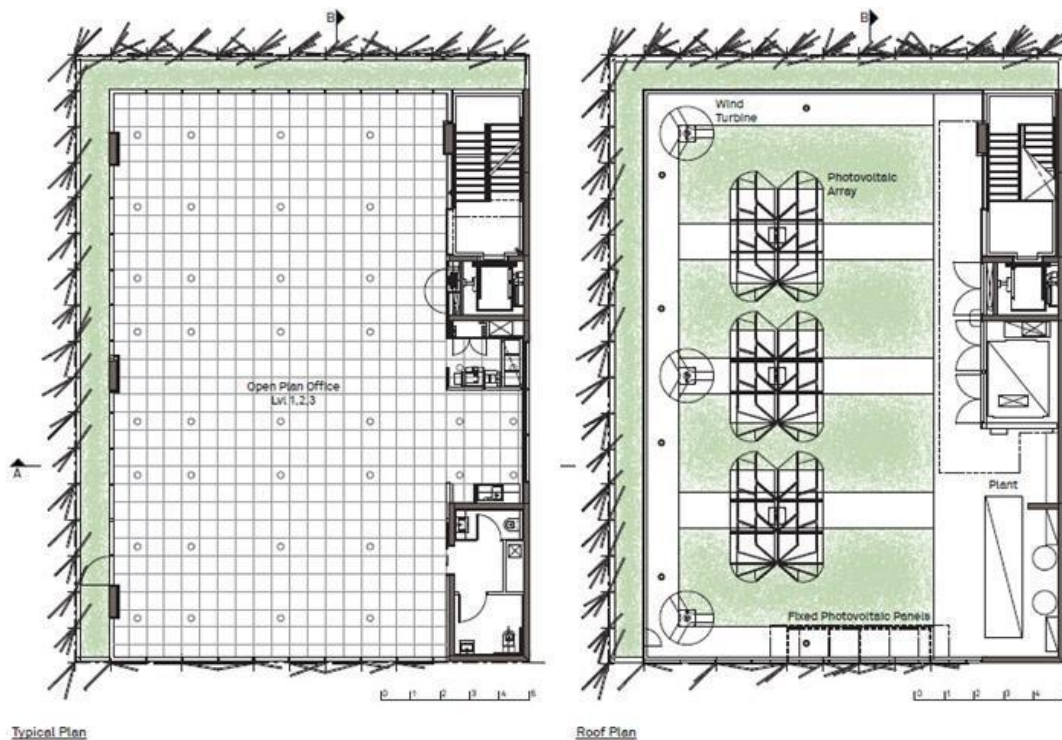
Roof plan of the solar panels wind tunnel and vegetation (Source: Studio 505)
